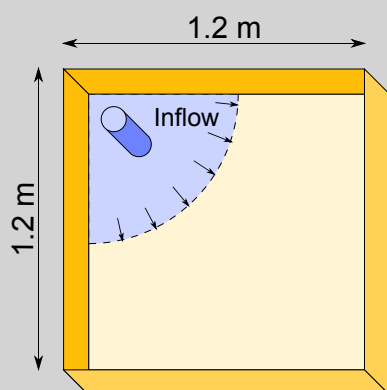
Layout of the slab casting. The casting was performed into the formwork made of oiled glue-laminated plywood and ordinary plywood.
